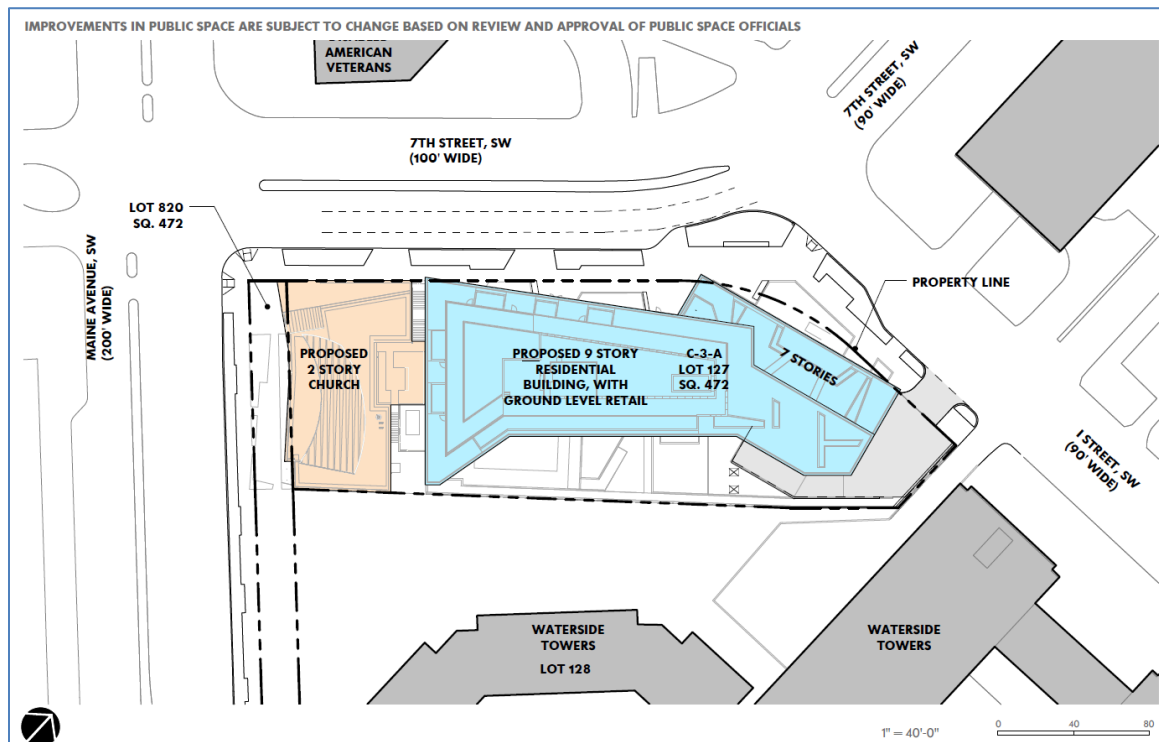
Proposed Generalized Site Plan (Sheet 9 of Application)
